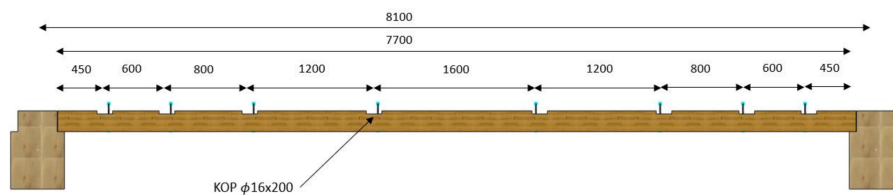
Cross-section of TCC floors, type 1 [72].
